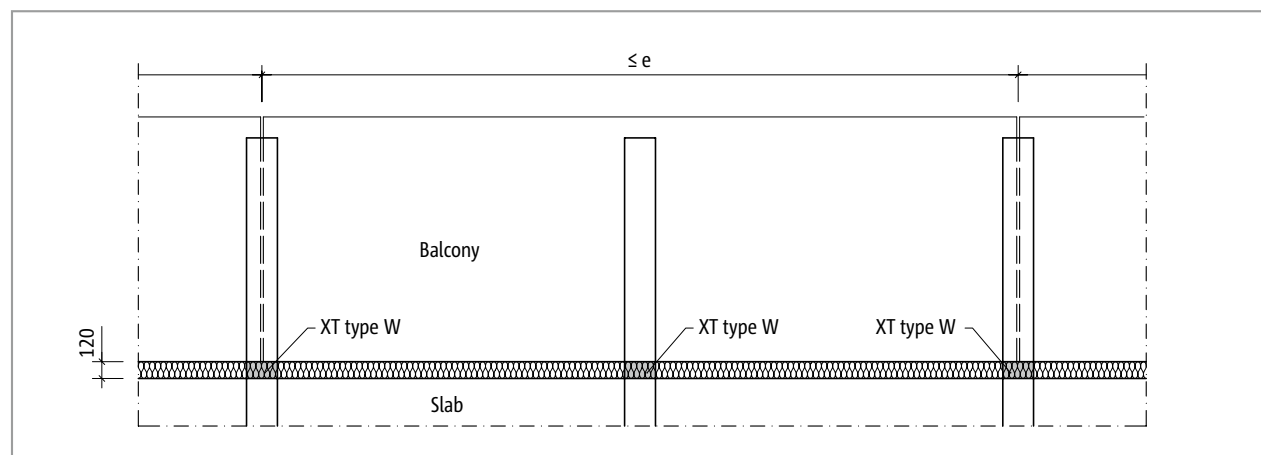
Schöck Isokorb® XT type W: Expansion joint arrangement
